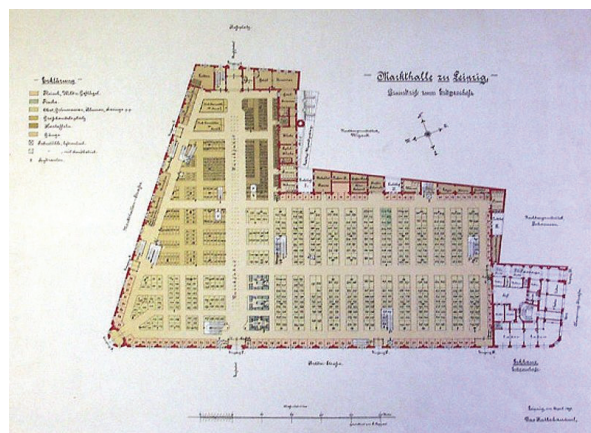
Central Market Hall in Leipzig – ground floor plan (source: [20])
